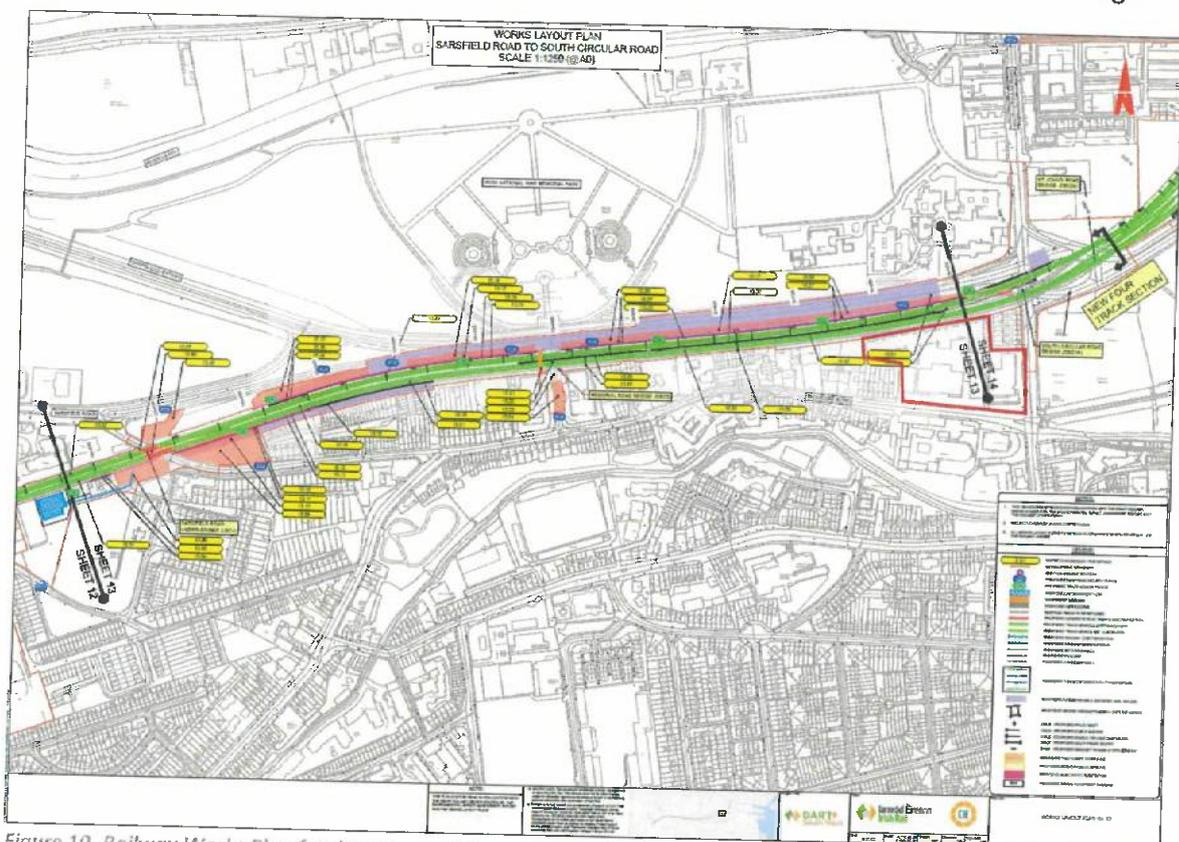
Railway Works Plan for the section of the railway adjacent to the subject property (Site Layout Plan No. 13)
